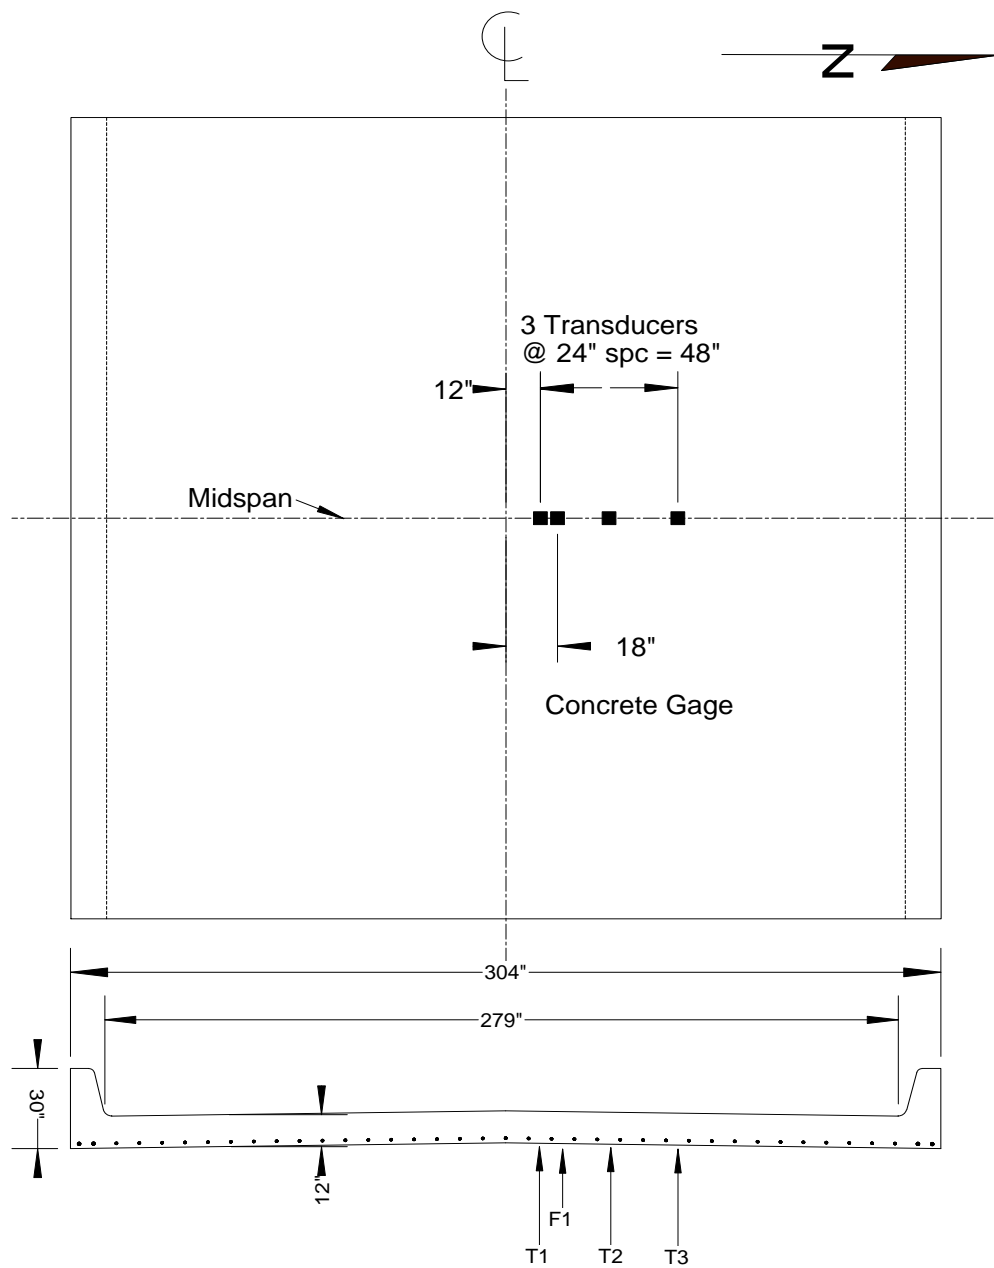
Detailed Locations of Transducers and Bottom of Slab Gage.
